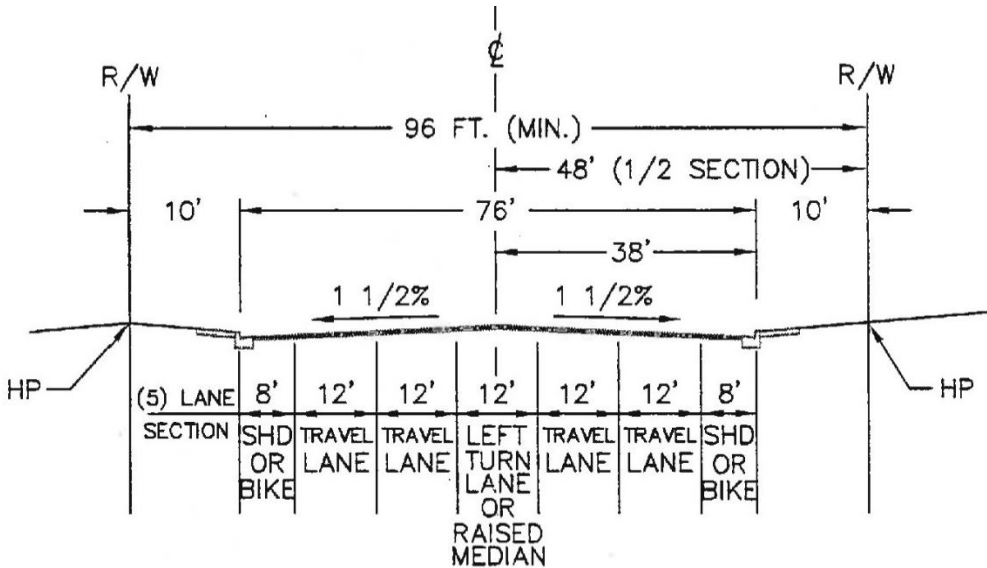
Arterial Street on 30-acre Property (Railroad Avenue)
